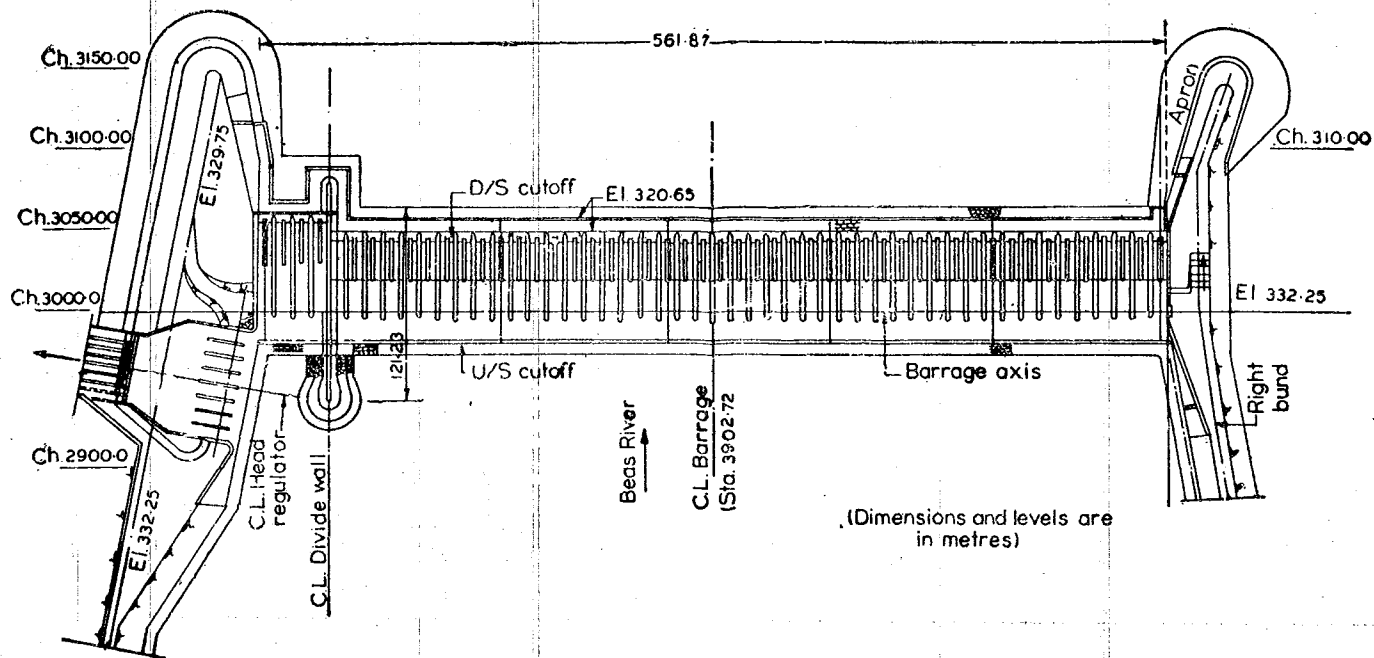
(b) Layout plan of Shah Nehar Barrage on Beas river in Punjab.
